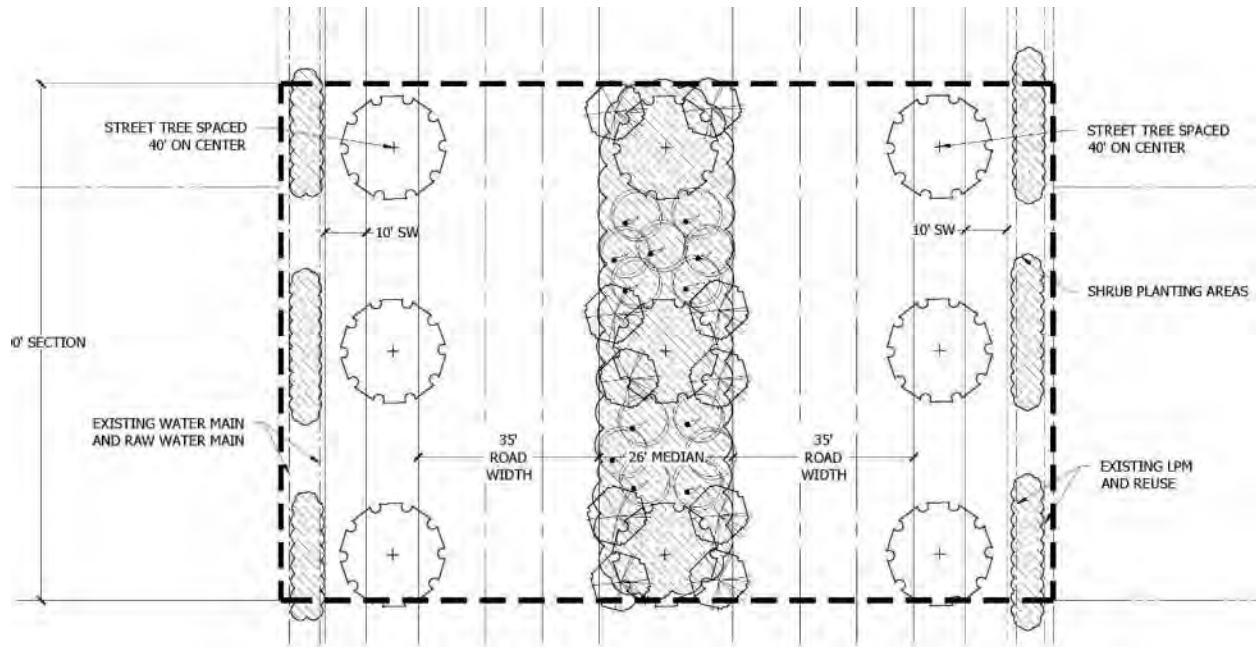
Typical 100-foot Plan View Section of Enhanced 150-foot Right-Of-Way
